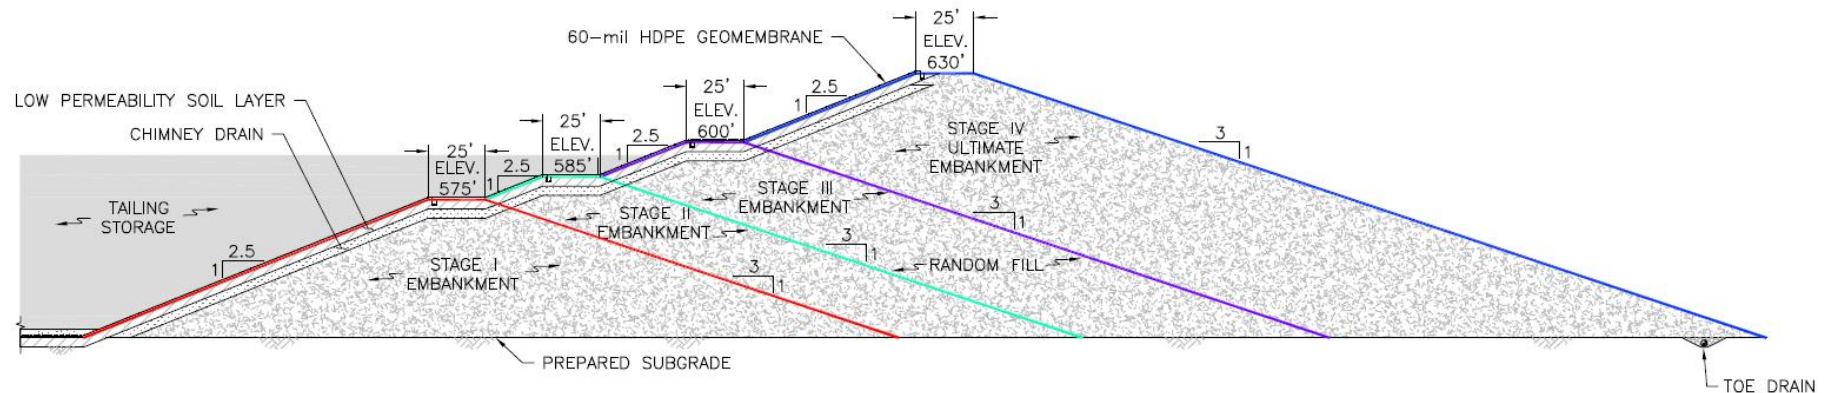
Cross Section of the Tailing Storage Facility Embankment Showing the Stages of Construction
